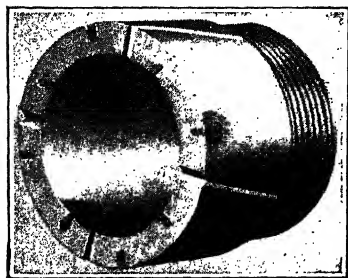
Diamond bit. (Jacoby and Davis, "Foundations of Bridges and Buildings," 3d ed.)
